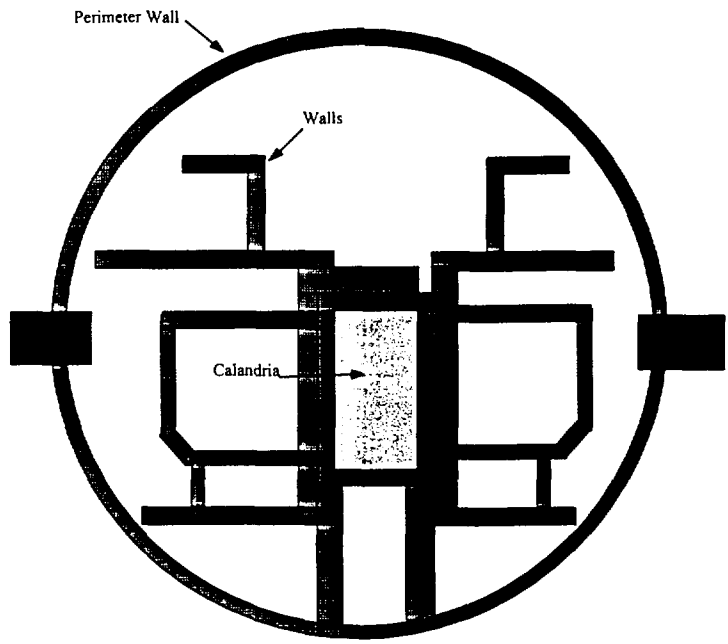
A typical CANDU 6 Generating Station, Reactor Building, General Plan
